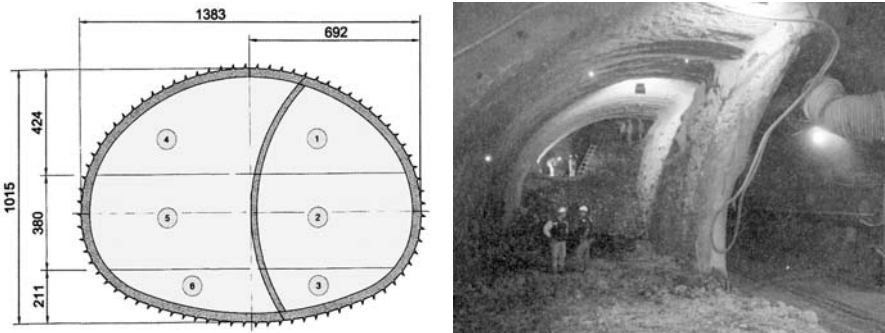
Single sidewall drift station excavation, Metro de Santiago, Chile 2003 [6]
